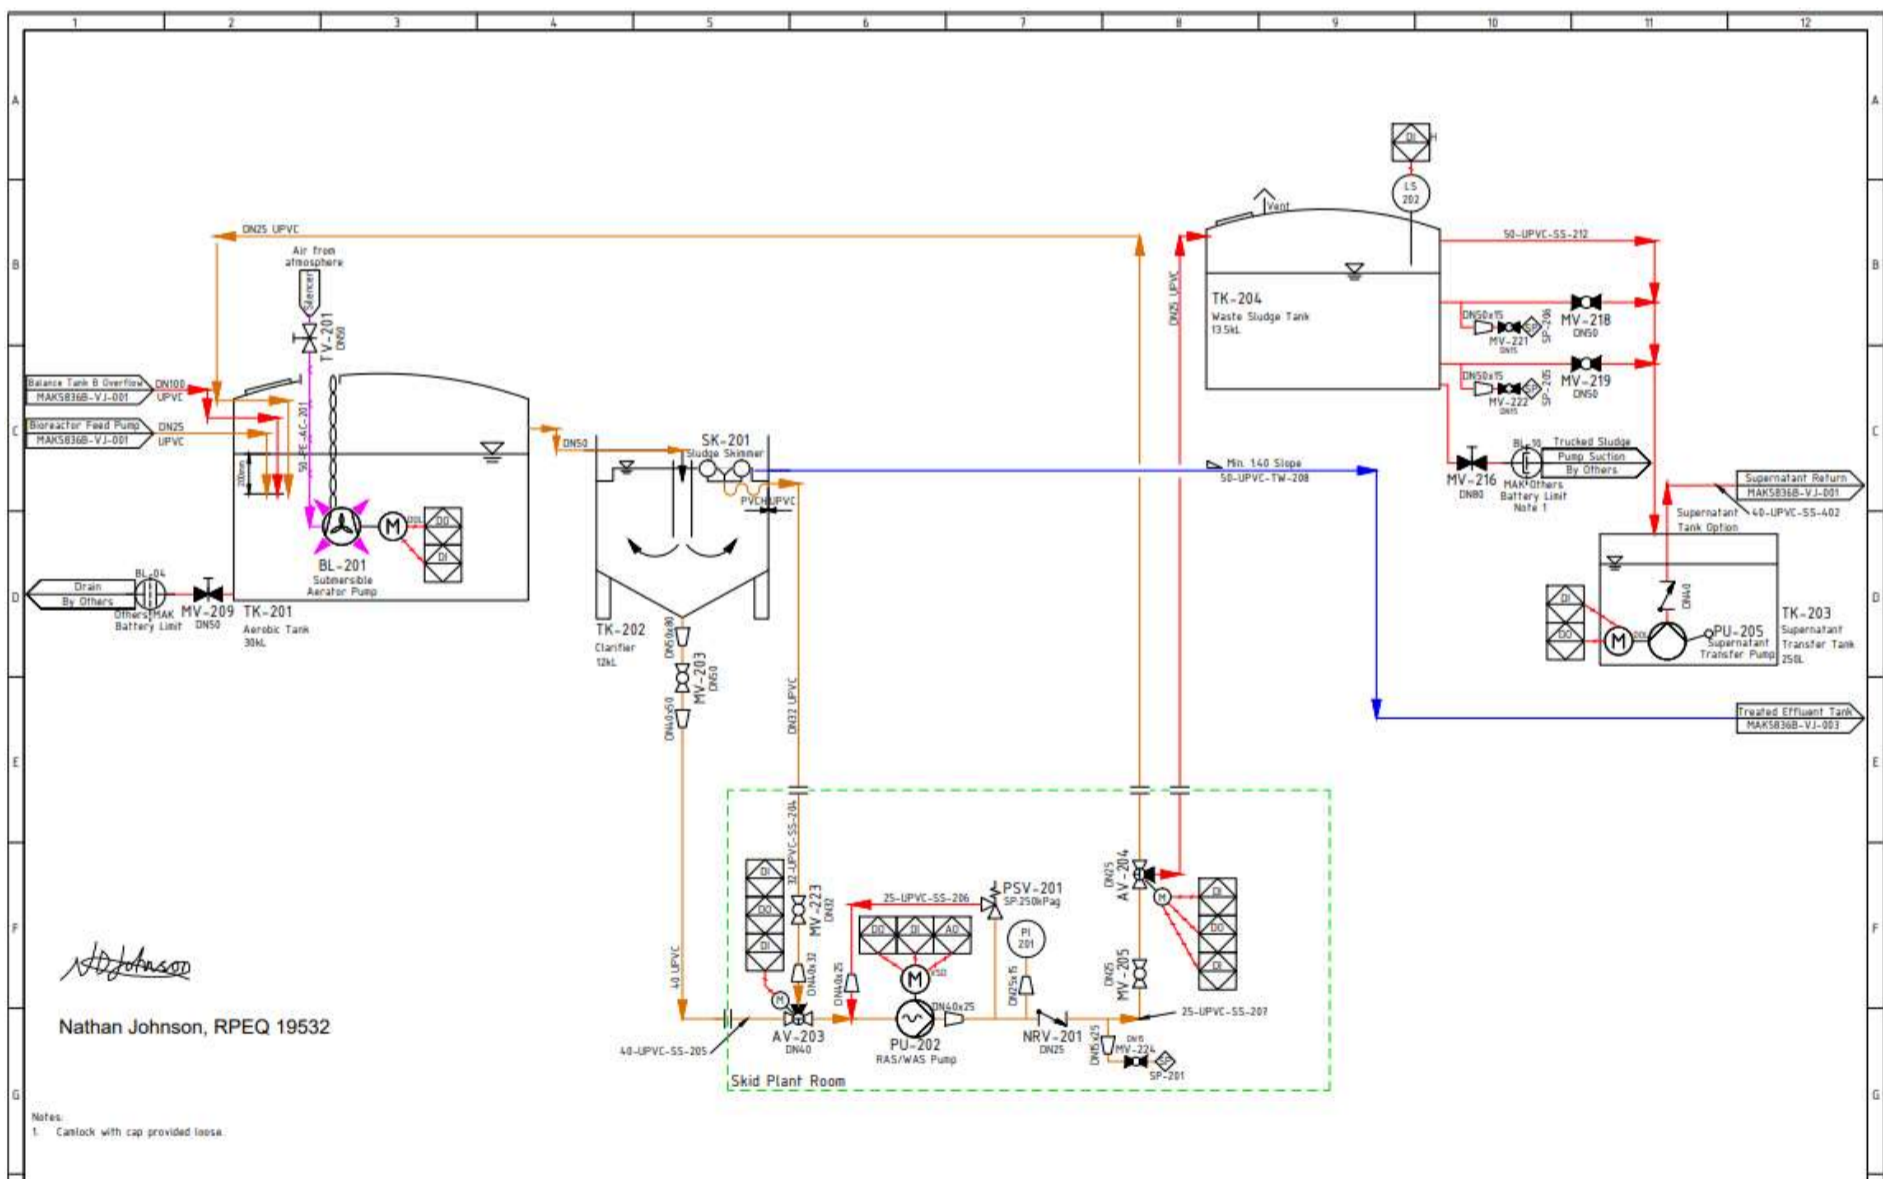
Wastewater Treatment Plant Bioreactor and Sludge Tank Piping and Instrumentation Diagram
